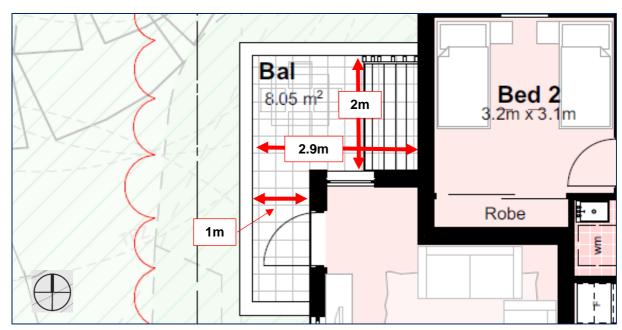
| Example of 'L' shaped balcony (Source: Applicant's RtS)
